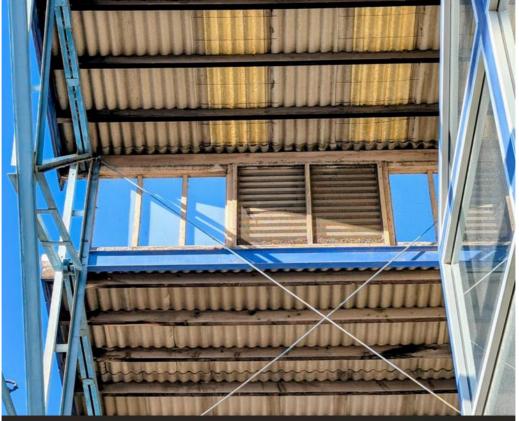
Figure L. Eastern (open) end of Shed 1 showing original highlight light and ventilation frame detail and underside of the Fibrolite roof sheeting (June 2025 photographer section)
